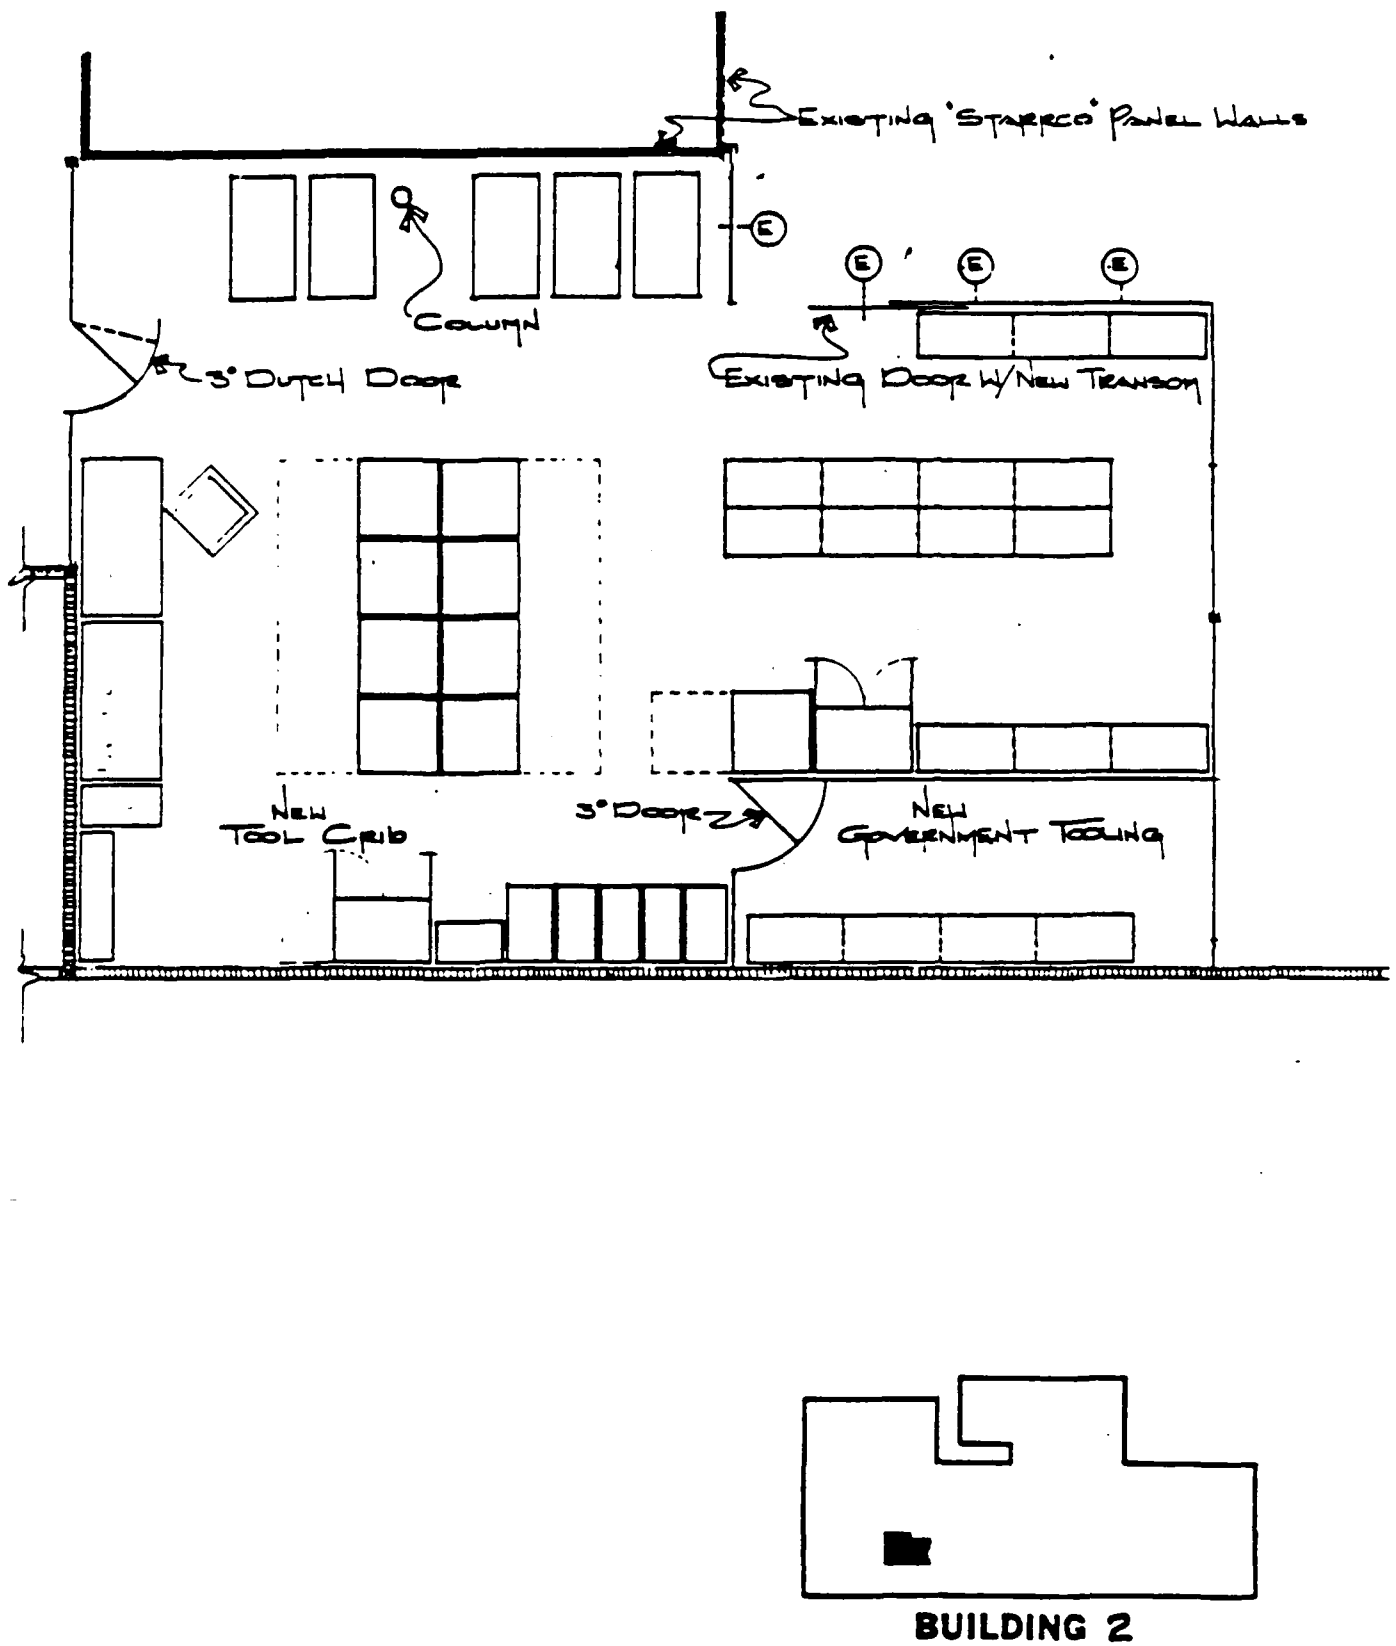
IMPROVED TOOL CRIB LAYOUT
